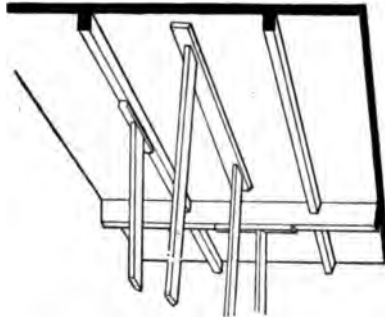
Under Side of Floor System with Molds Removed and Post Supports.
